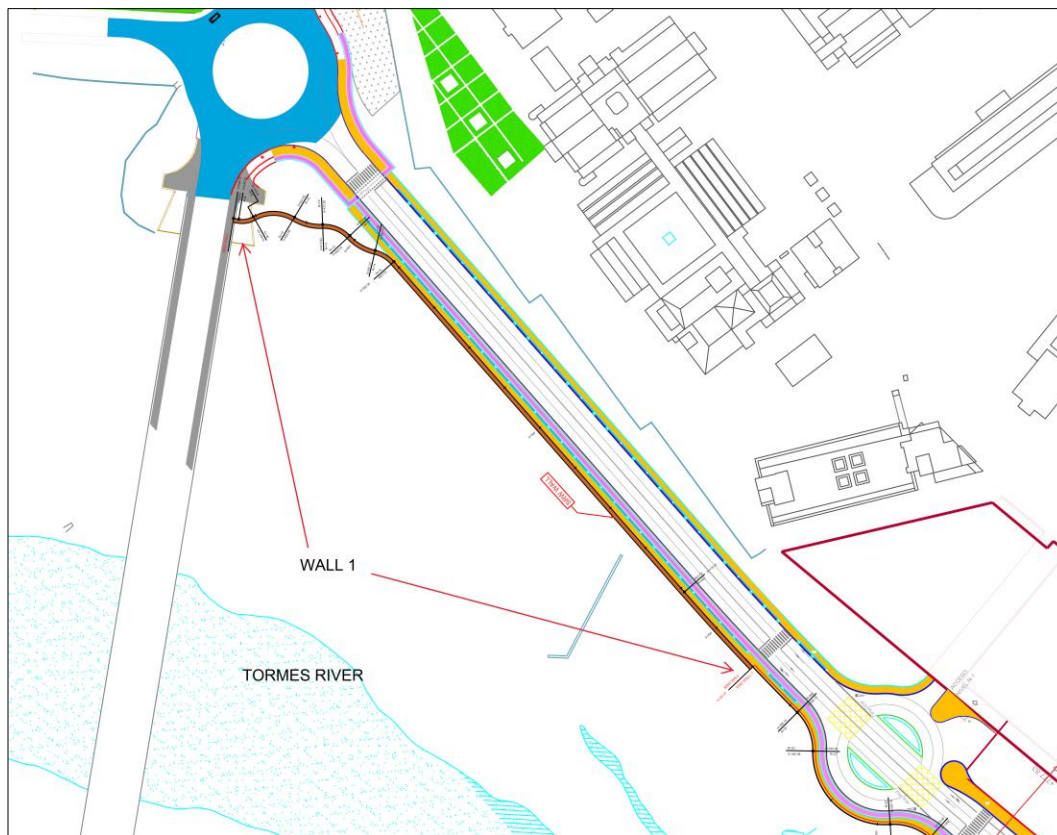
Plan view of wall 1 (Orbe Técnicas y Medioambiente).
